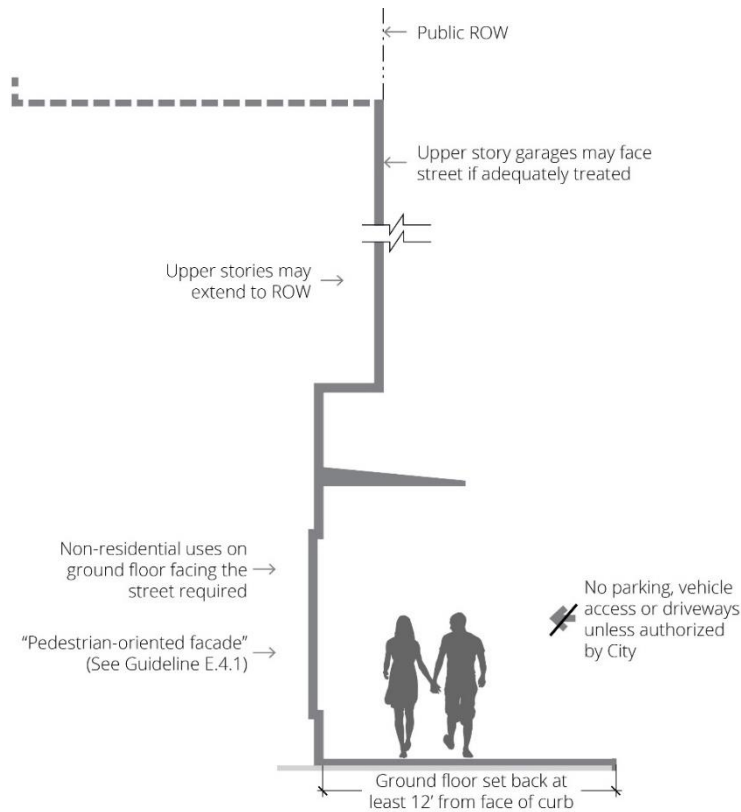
f. Summary of requirements for building façades facing a designated pedestrian-oriented street. (This diagram is for illustrative purposes only. See Section C.1.2 for stated requirements.)
